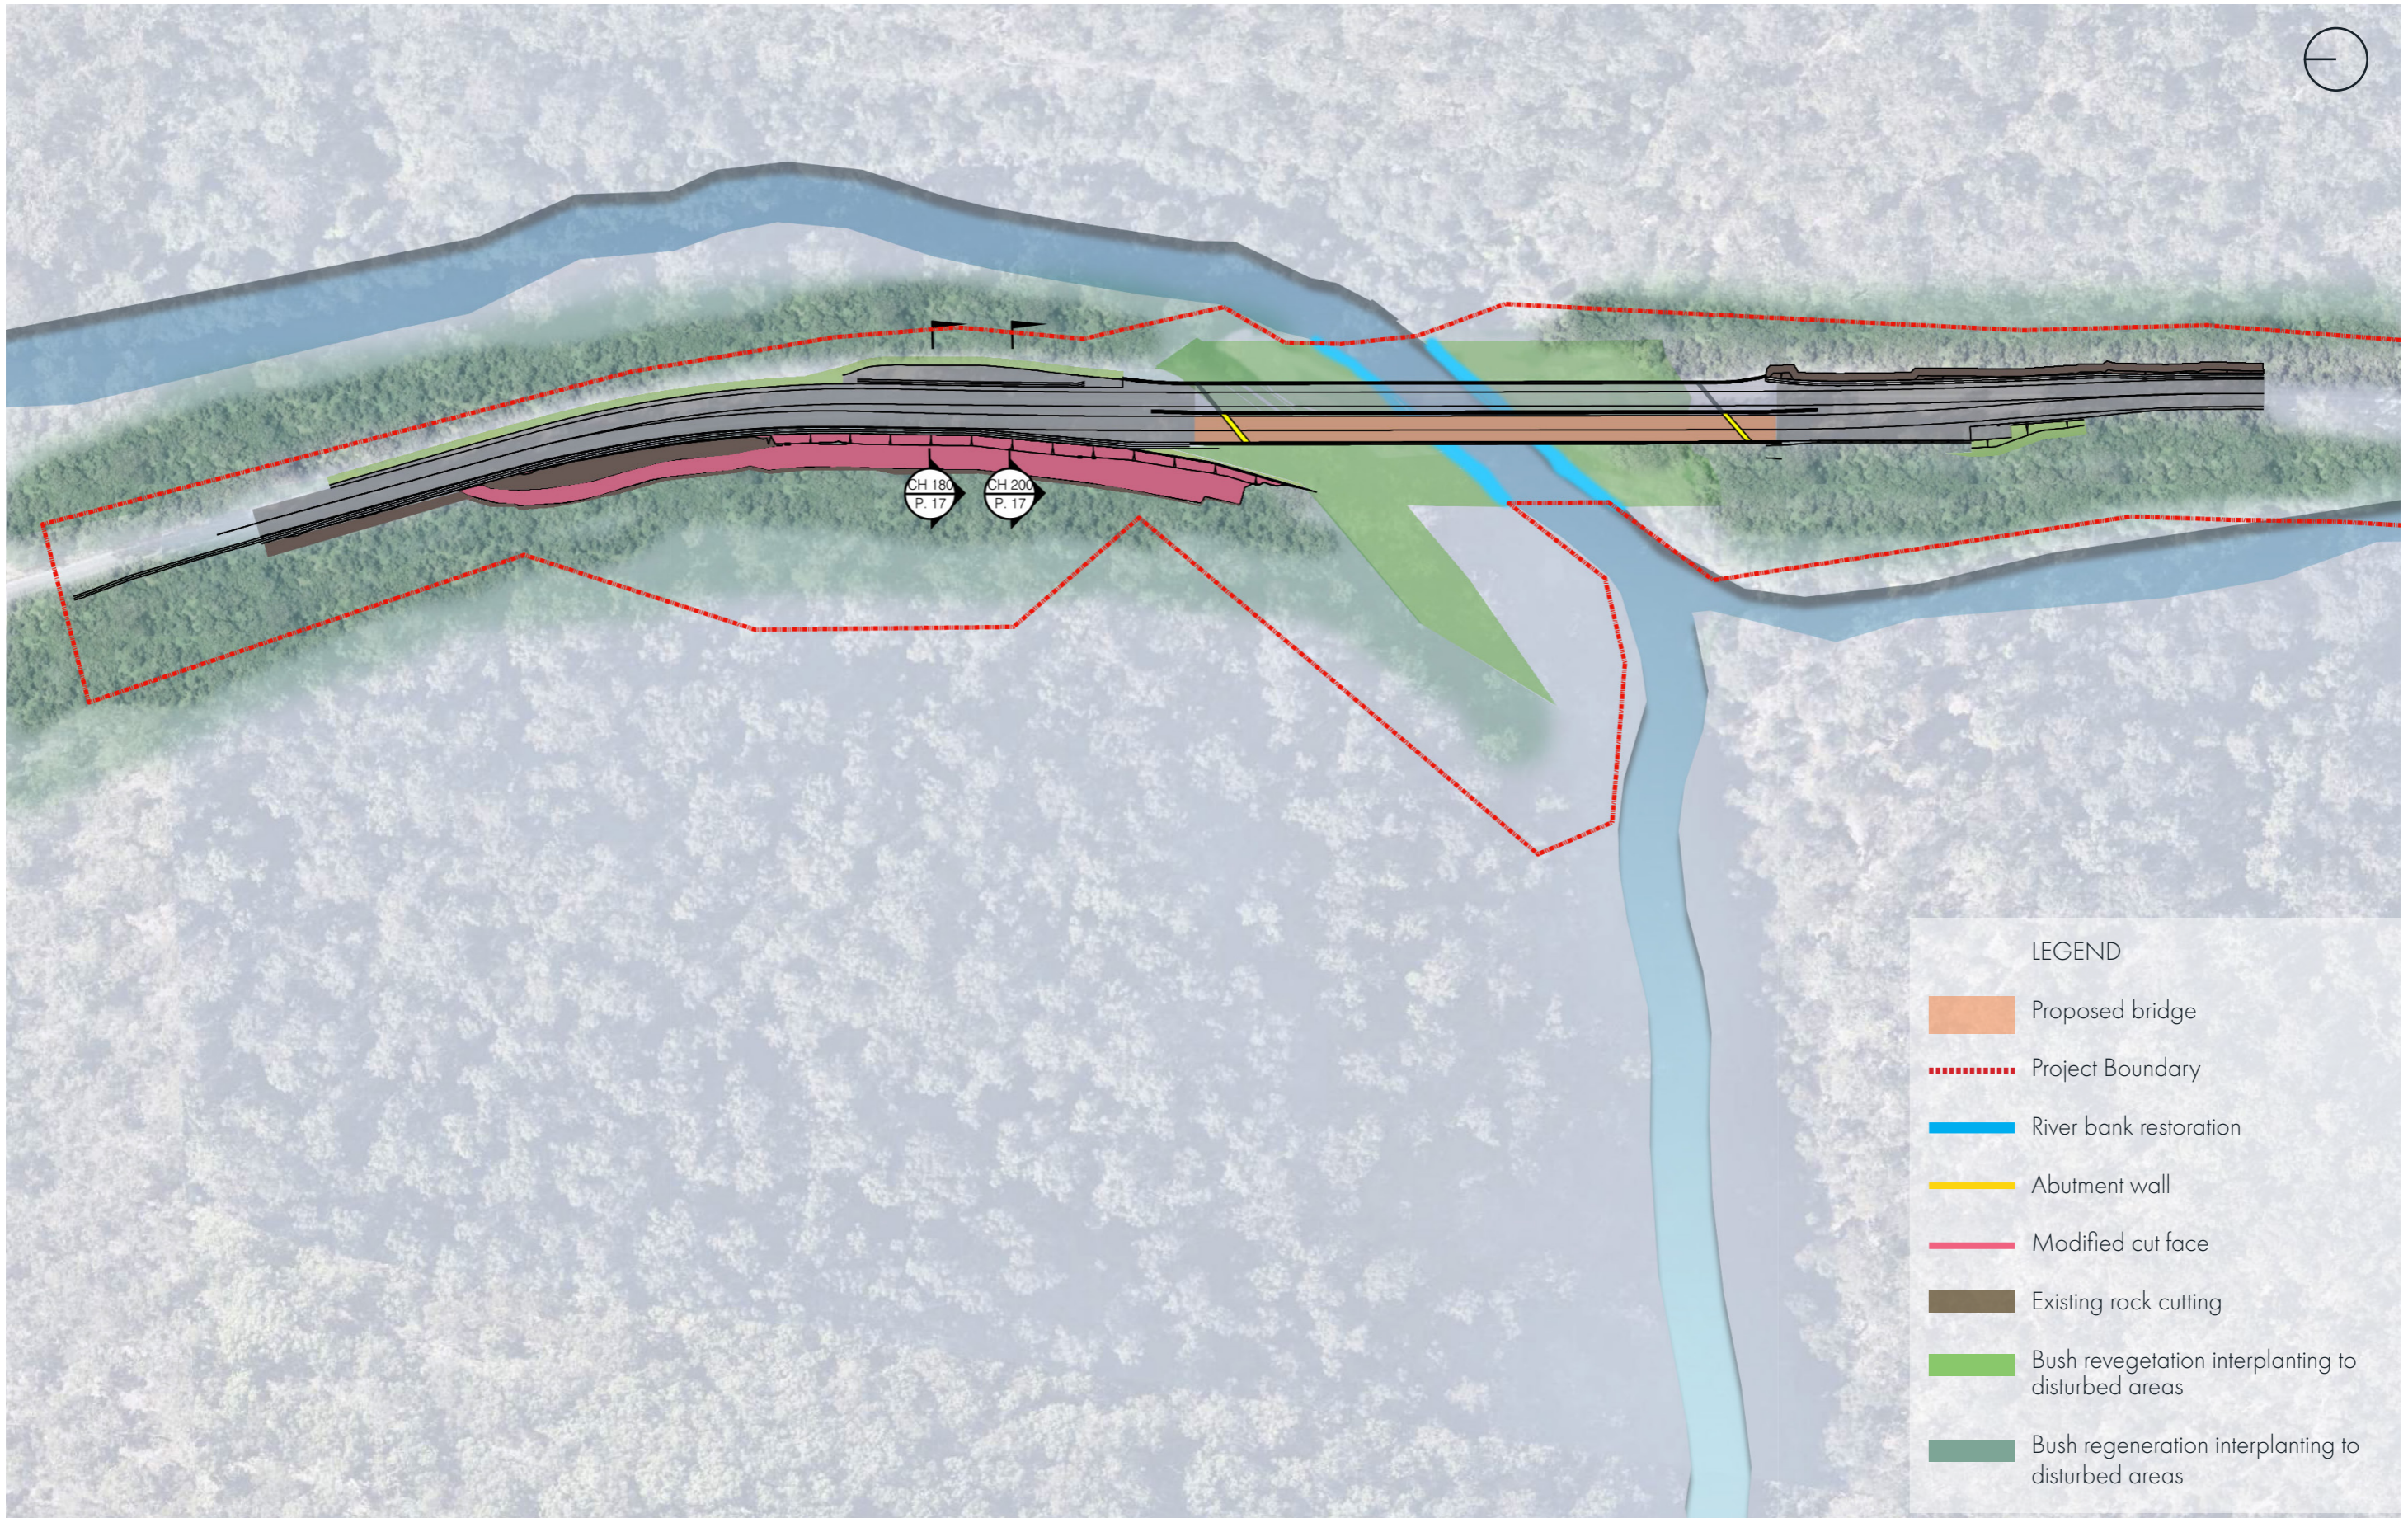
Detail of proposed bridge structure and its relationship to existing bridge
